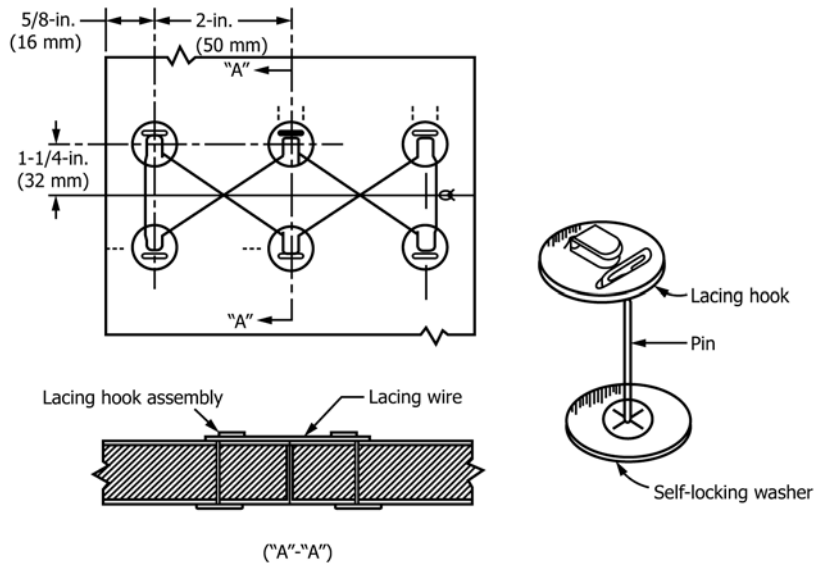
Alternate Method of Lacing Removable/Reusable Blankets Using Mechanical Hook Sets
